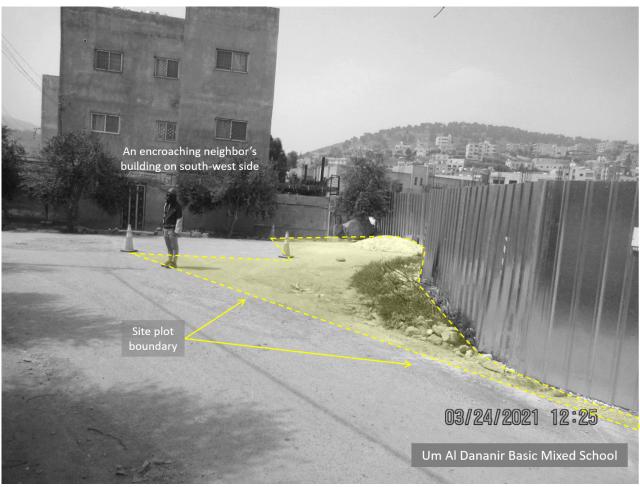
There is an encroachment of the existing neighbor's building toward the site
